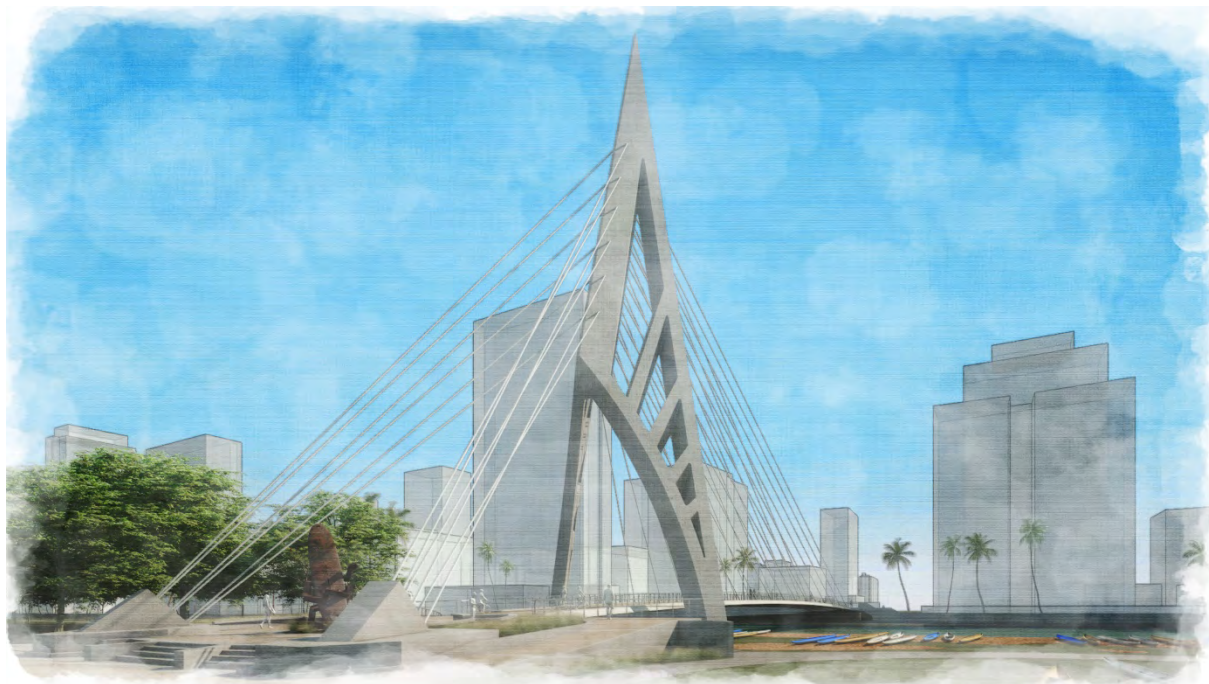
Architectural Rendering of Proposed Cable-Stay Bridge across the Ala Wai Canal. Source: HDR.
